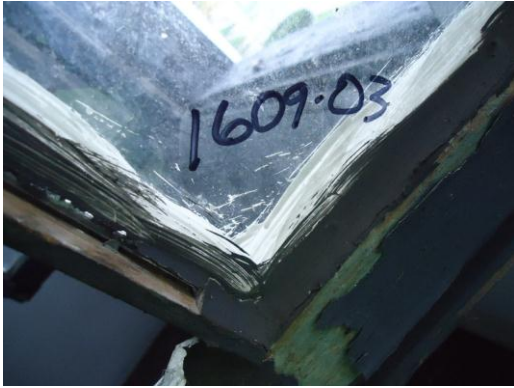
Window caulk (1609-3) Hallway South Wall. No Asbestos Detected.
